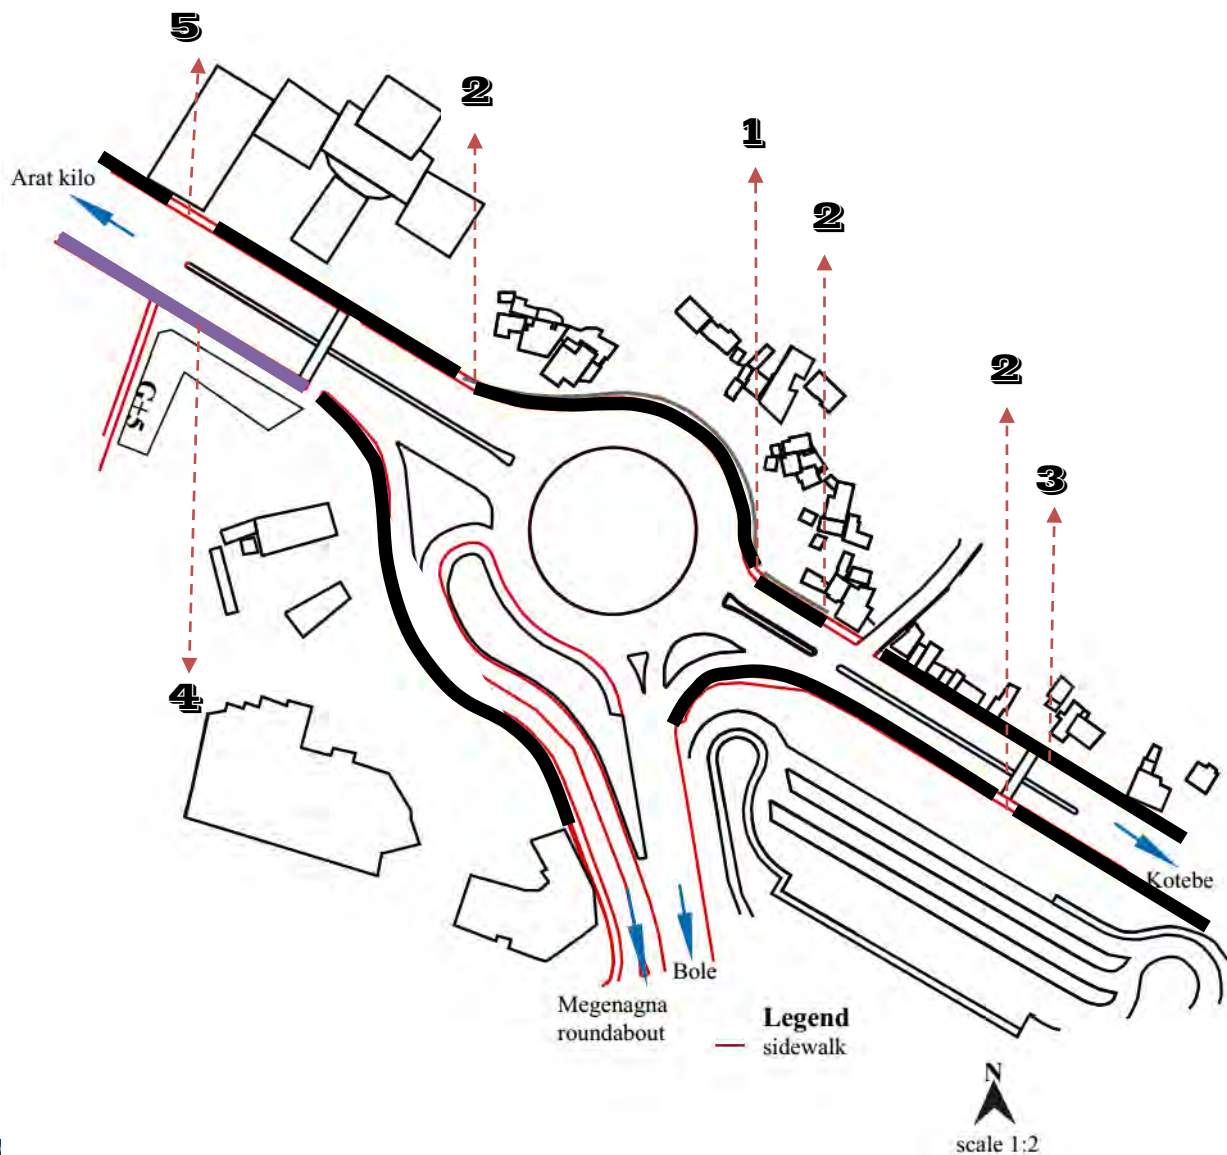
Connectivity of roundabout with surrounding and the connecting elements (source; Addis Ababa structural road network map and edited based on survey and photo taken by; Senait Mohammed, 2006)
